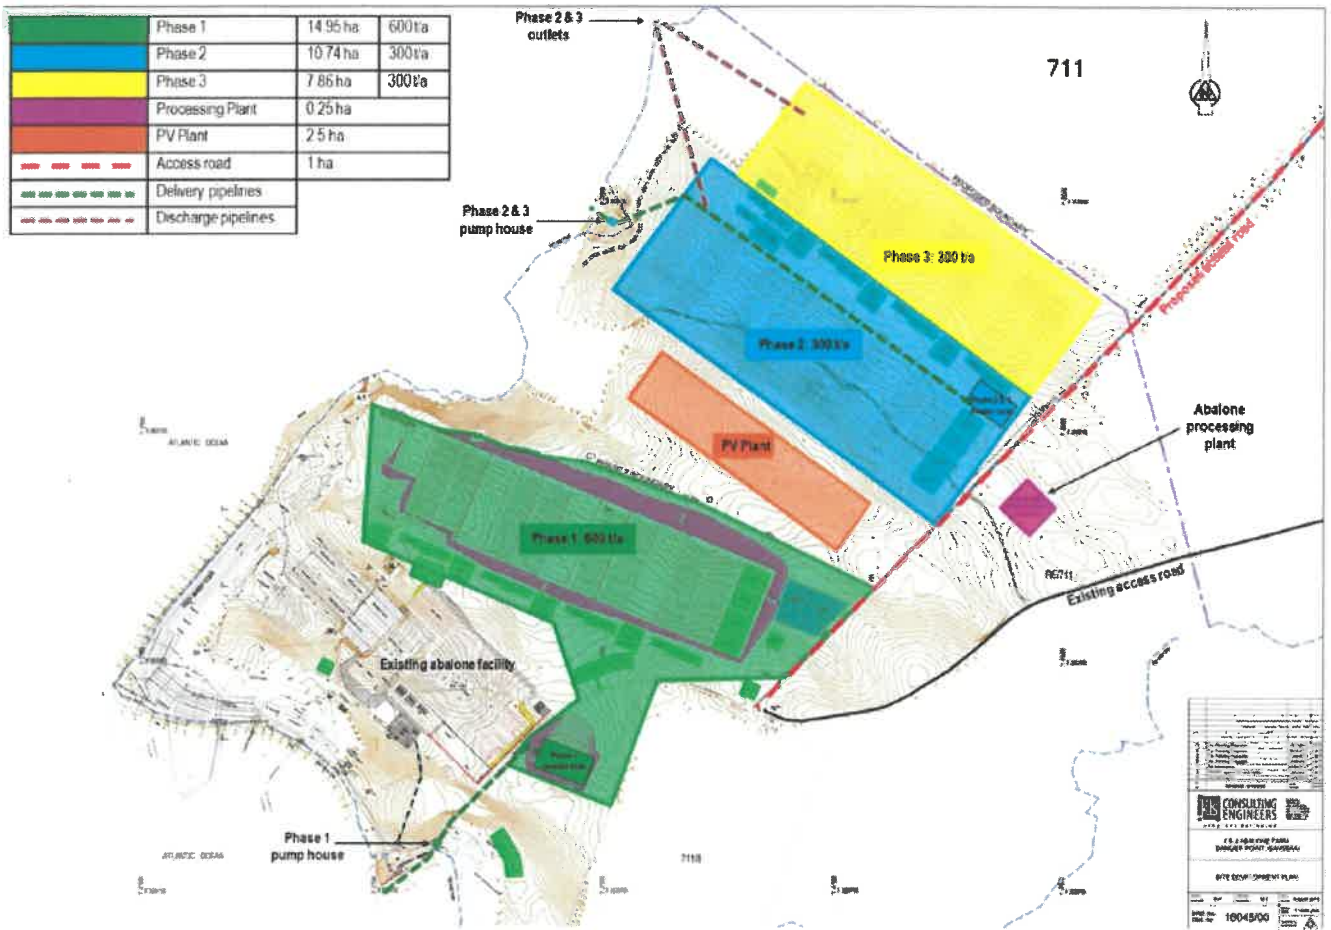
Site Plan indicating the location of the processing facility (purple block) on Remainder of Farm Klipfontein No. 711, Danger Point near Gansbaai. The other components will be developed as part of the authorized expansion for the existing abalone facility (Reference number: 16/3/3/2/E2/4/1027/18).
